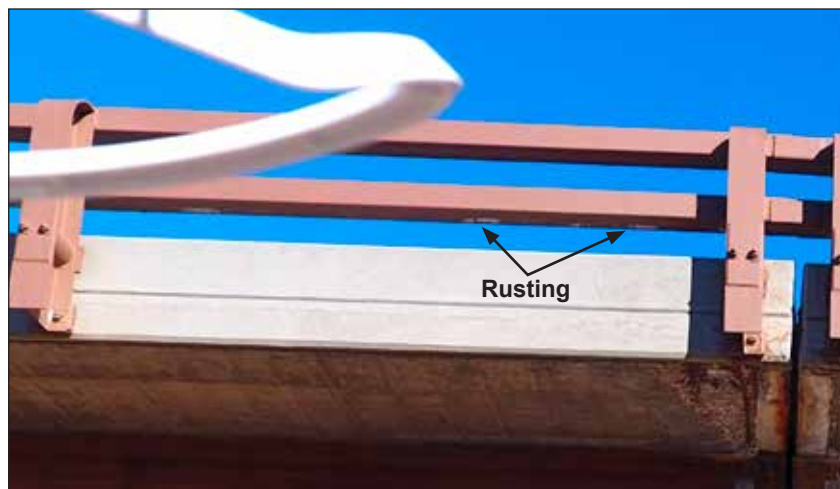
Sample damage on railing near Stringer 1 at Joint 4.
